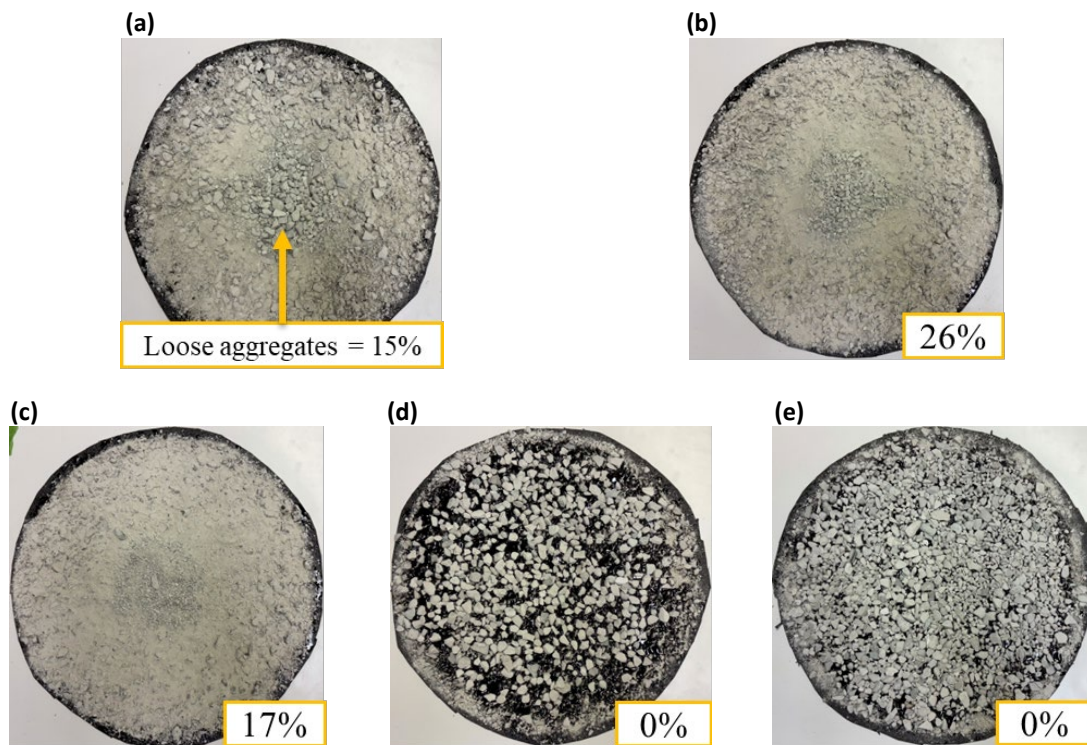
Photos. Double-layer Otta seal specimens prepared using several configurations, with loose aggregate piled at the center: (a) specimen without separation of aggregates, (b) specimen with aggregates separated using No. 4 sieve with fines on the top layer, (c) specimen with aggregates separated using No. 8 sieve with fines on the top layer, (d) specimen with aggregates separated using No. 4 sieve with coarse particles on the top layer, and (e) specimen with aggregates separated using No. 8 sieve with coarse particles on the top layer.
